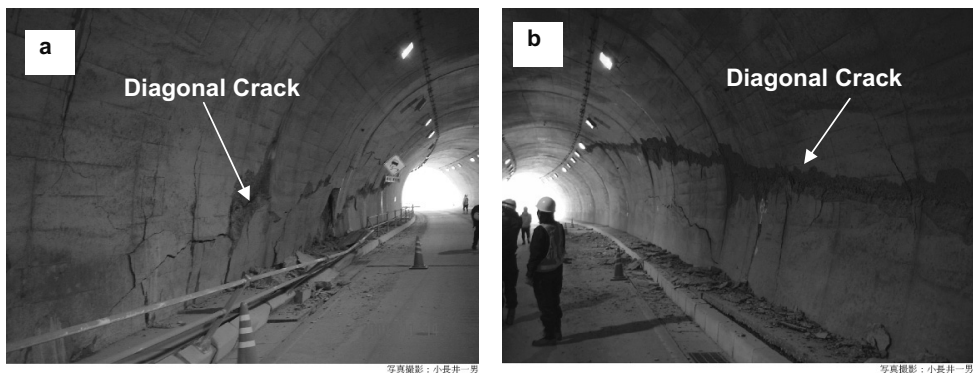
Diagonal cracks on both walls of Kizawa Tunnel (a) The west side of the tunnel (b) the east side of the tunnel (Photo by Konagai, K.)
